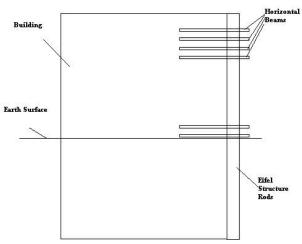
Cut section side view of building with MegEifel rod at side. MegEifel rods further have horizontal beams at each floor.
